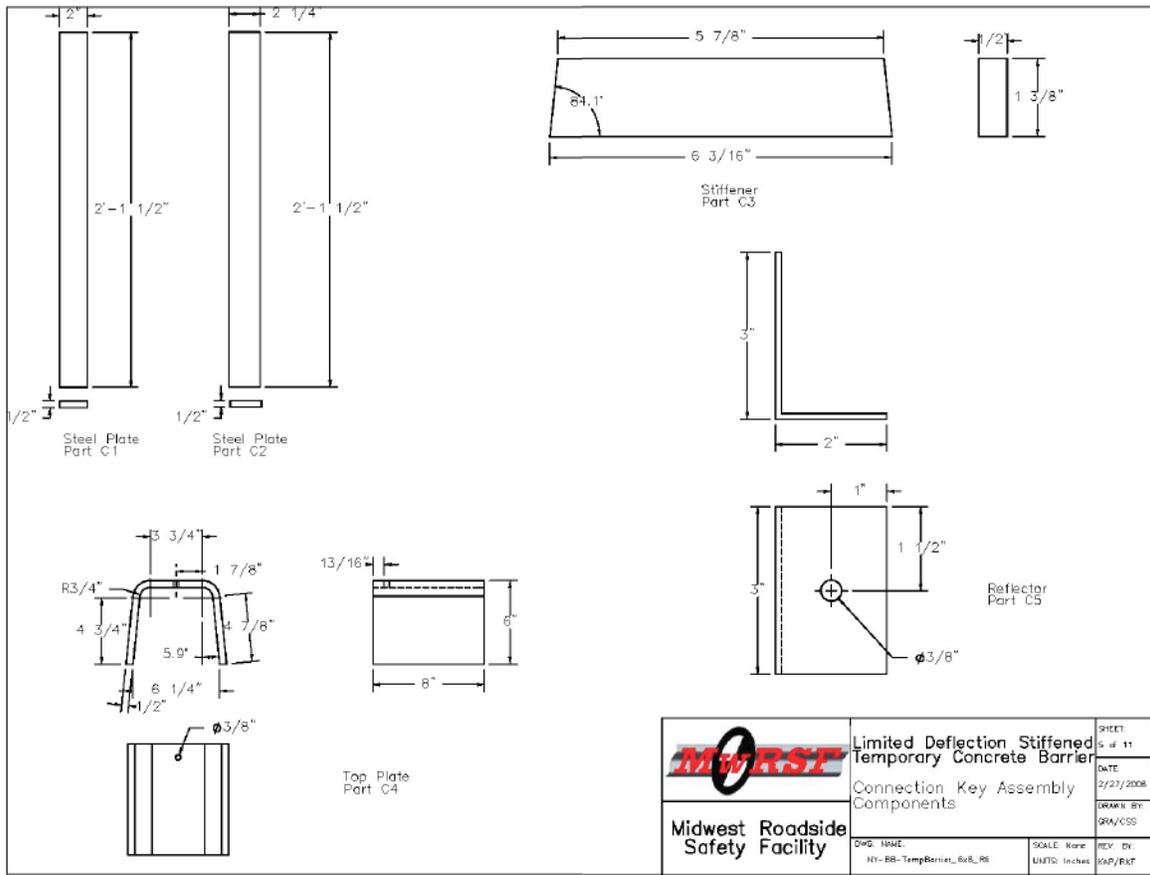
Connection Key Assembly Details (English), Test NYTCB-3
